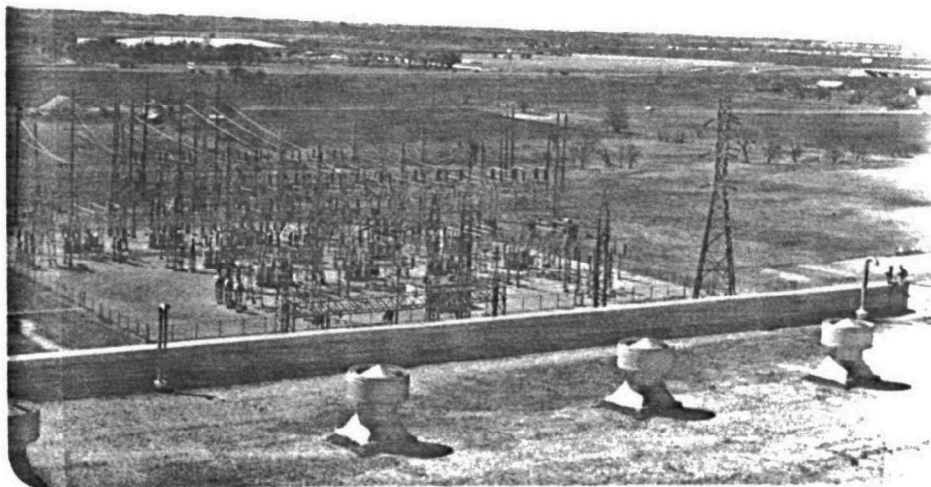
View from the boiler house roof looking south. The 138 KV substation is shown in the center of the photograph. The surrounding farmland is shown in the background.
